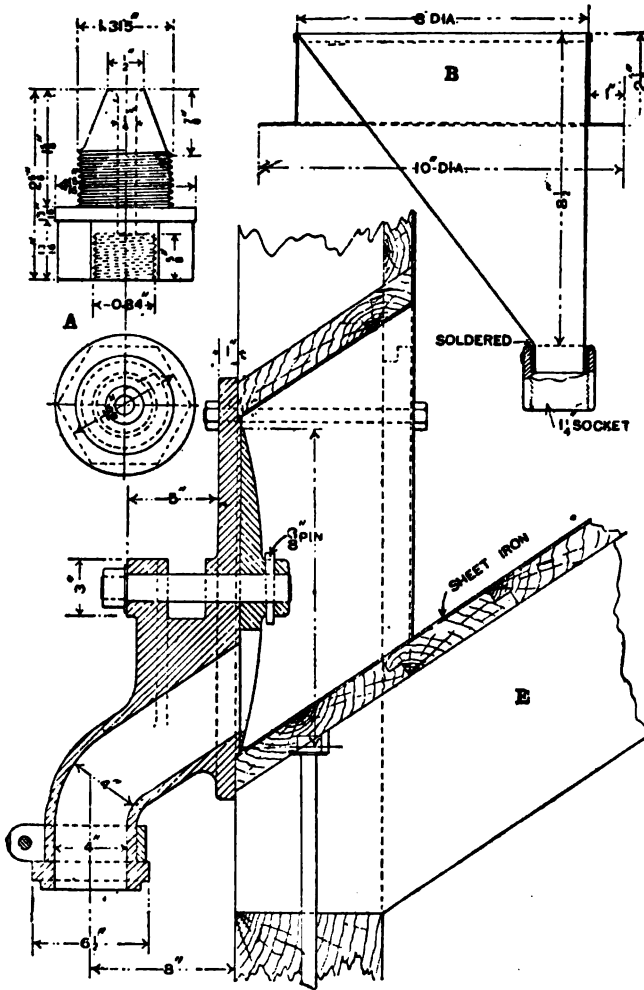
SAND PLANT, HORNELLSVILLE, N. Y.
